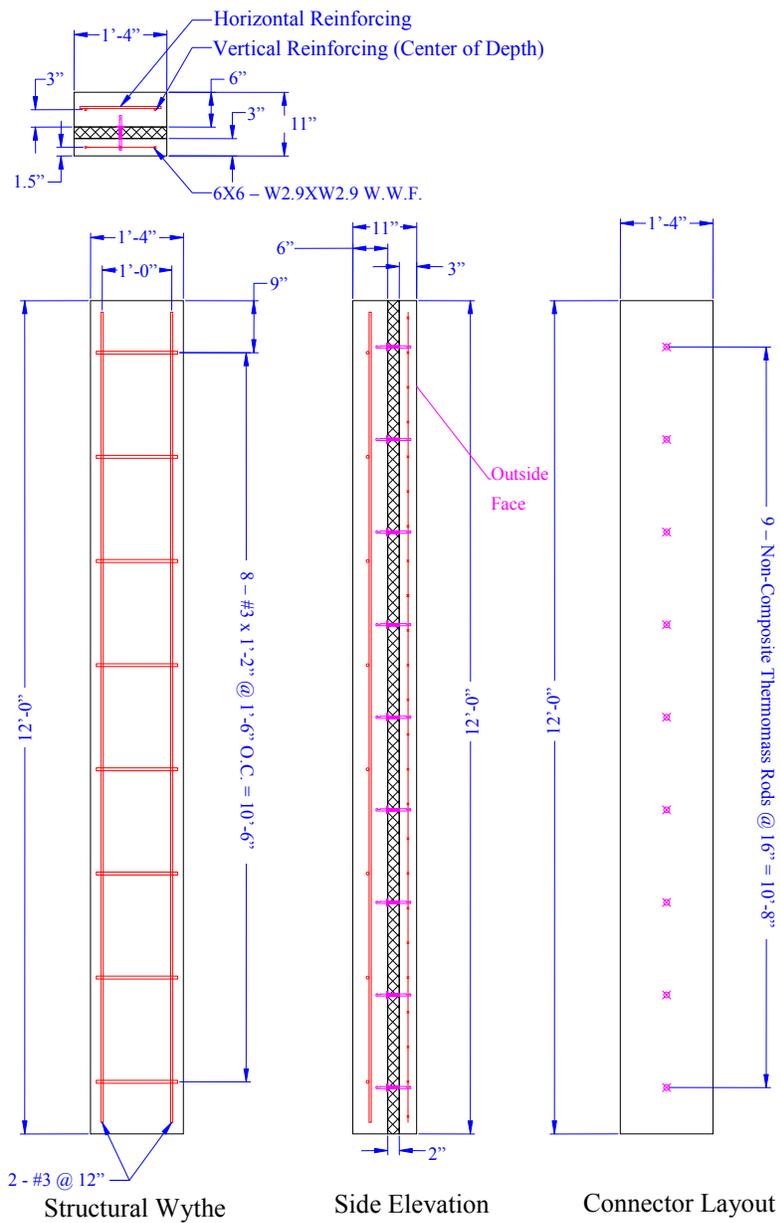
TCA Non-composite 6-2-3 Single-span Static Specimen TS1 Details
